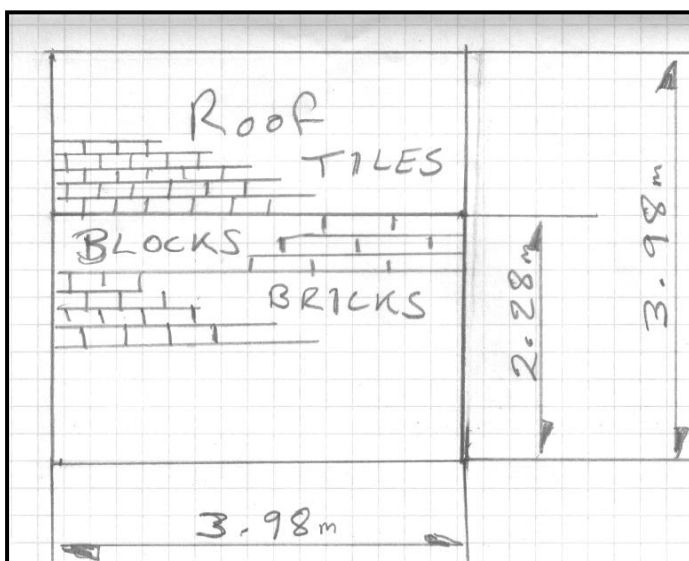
SW Elevation as currently exists – Original proposal now superseded
